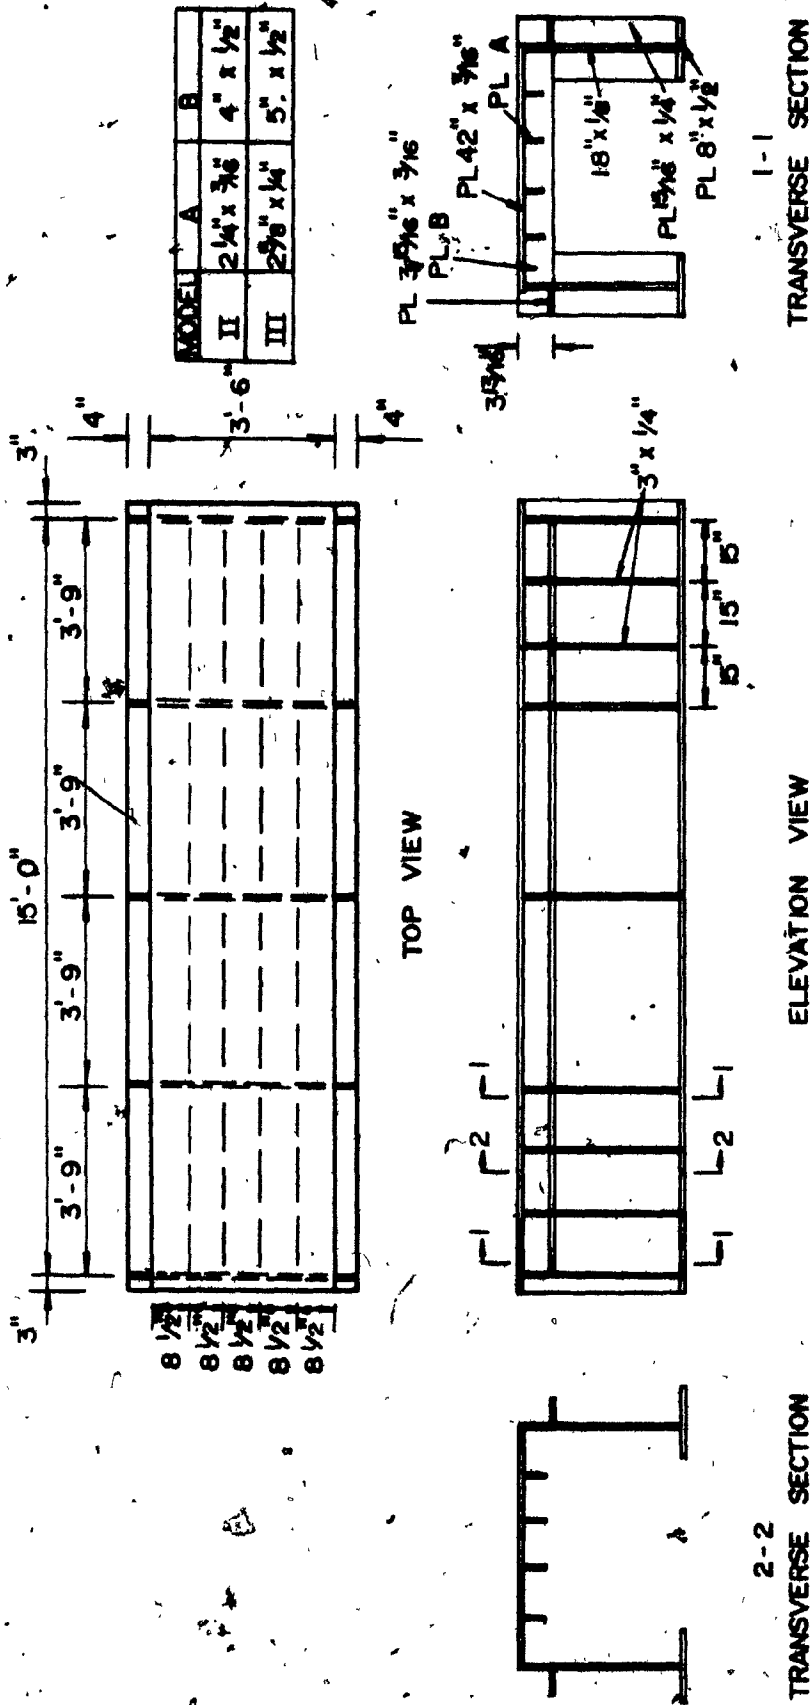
GEOMETRICAL ARRANGEMENT OF MODELS B AND C
